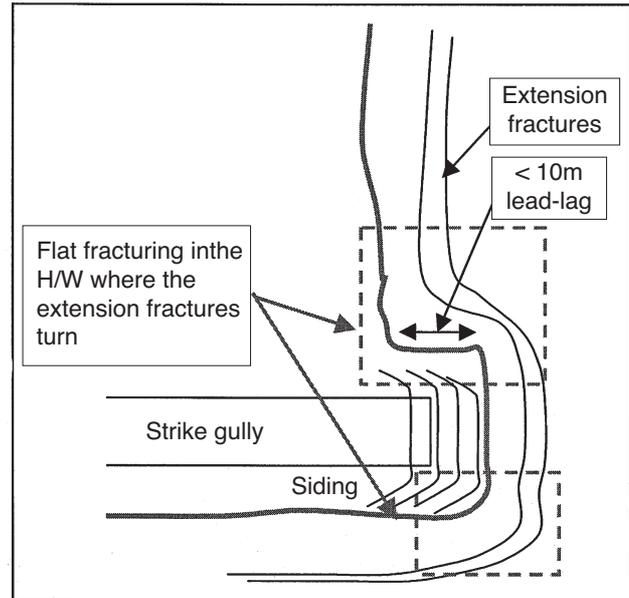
The flattening of extension fractures as they bend into the abutment (pillar)
